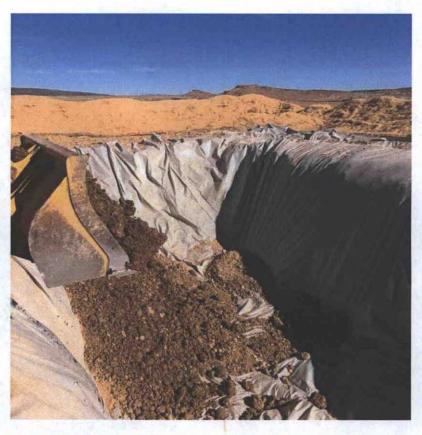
Placing the 3(clean):1(cuttings) mixed drill cuttings into the cuttings trench. The trench is lined with a 20-mil string reinforced LLDPE liner.
